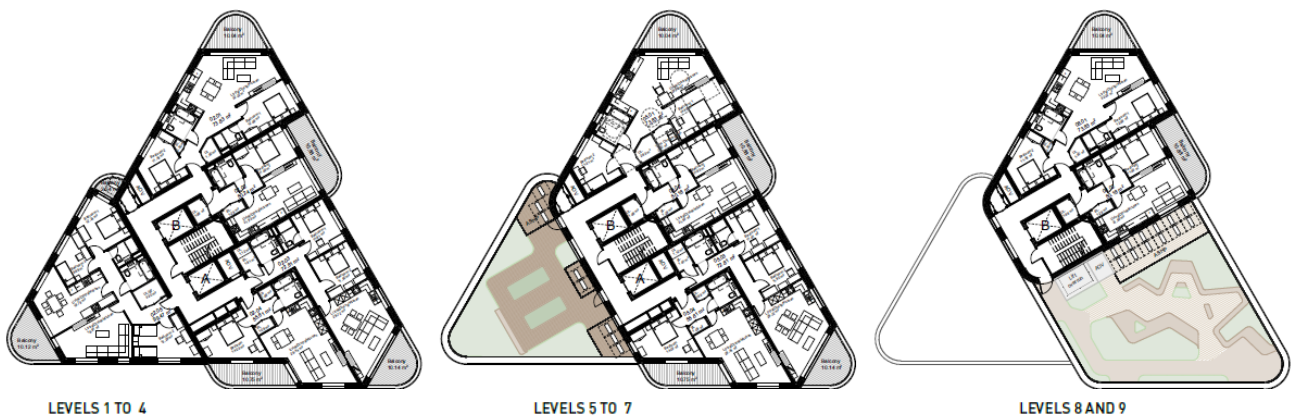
Proposed floor layouts – Stockwool (Dec 2020)
